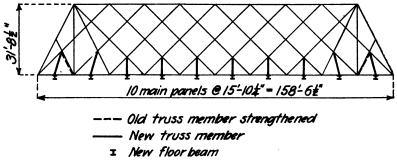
Method of Strengthening two Lattice Truss Spans.
